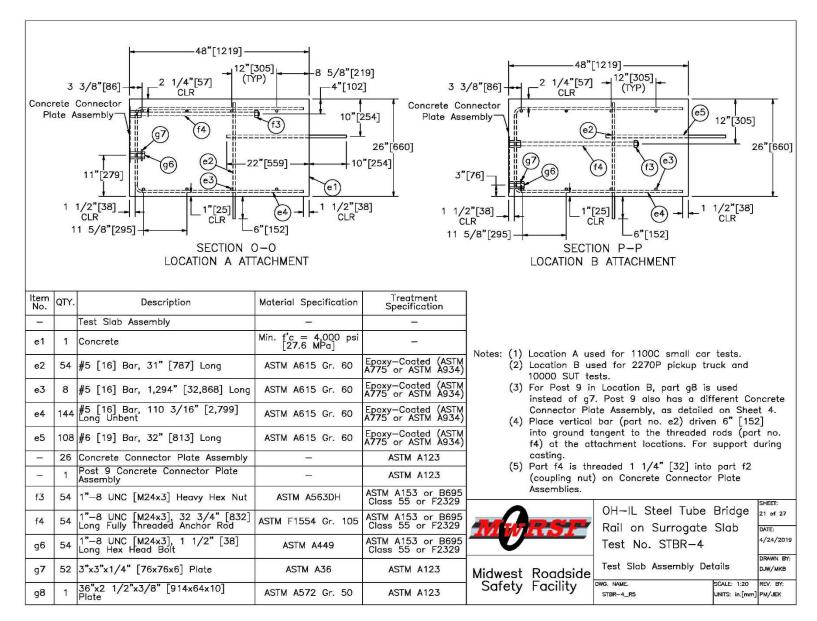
Test Slab Assembly Details, Test No. STBR-4
